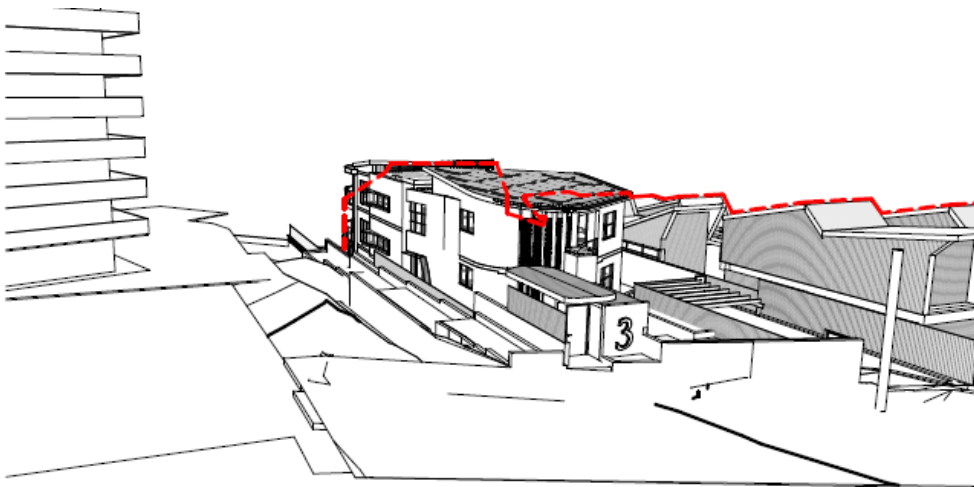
Plan Extract: Level 3 balcony view from 4 Lauderdale Avenue.
